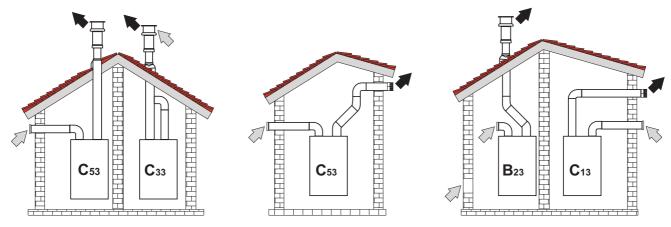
Examples of connection with separate pipes (= Air / = Fumes)
